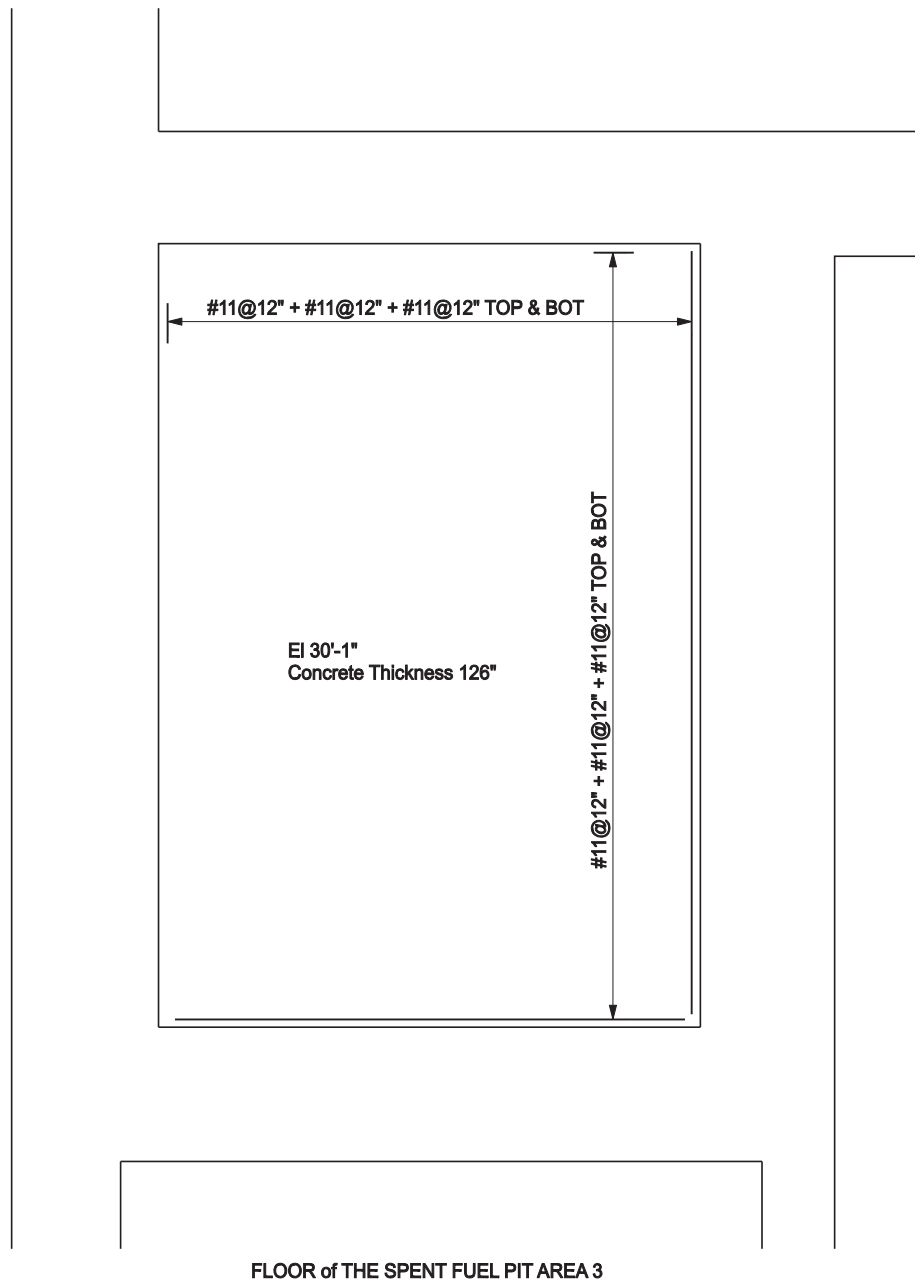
Typical Reinforcement in Spent Fuel Pit Slab – AREA 3
